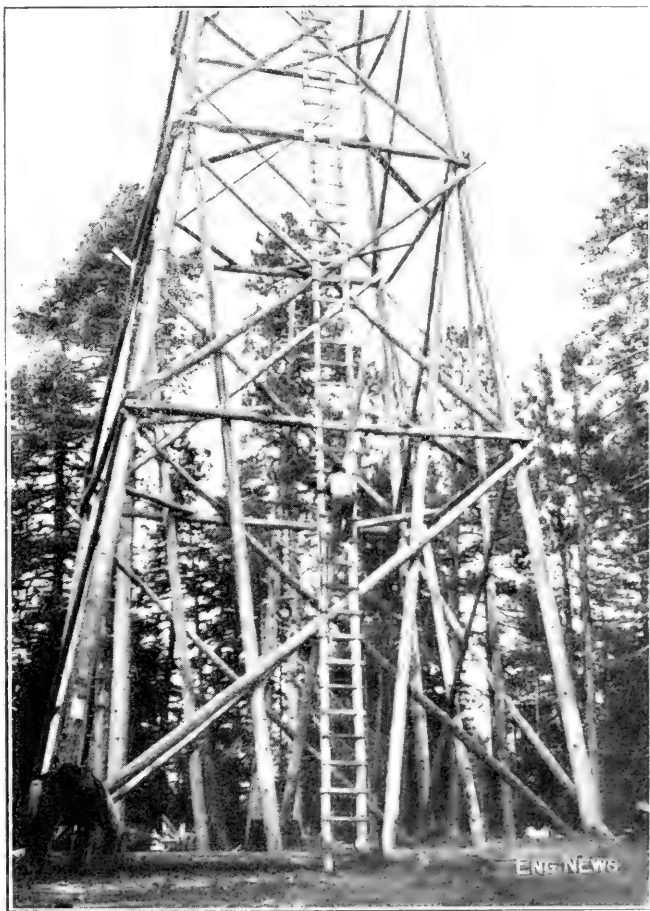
LOOKOUT TOWER SHOWING METHOD OF FRAMING.
